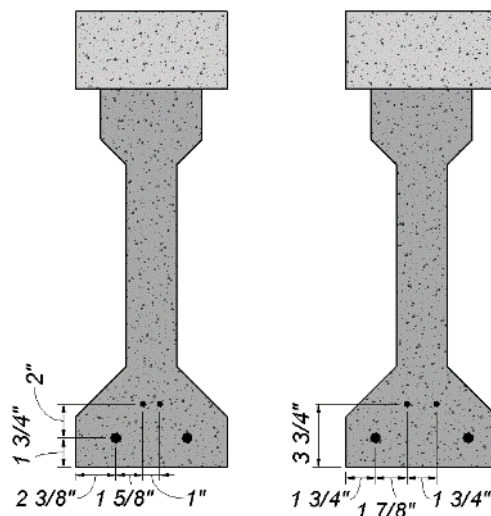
(Left) Inside longitudinal bars and (right) outside longitudinal bars
